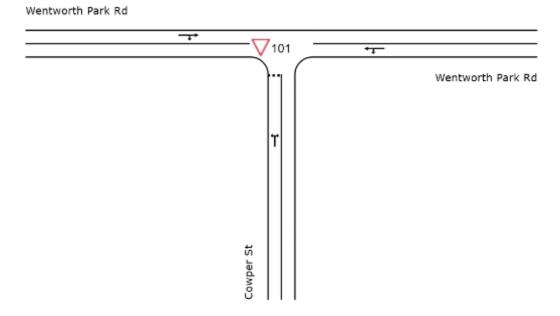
Existing Cowper Street / Wentworth Park Road configuration
